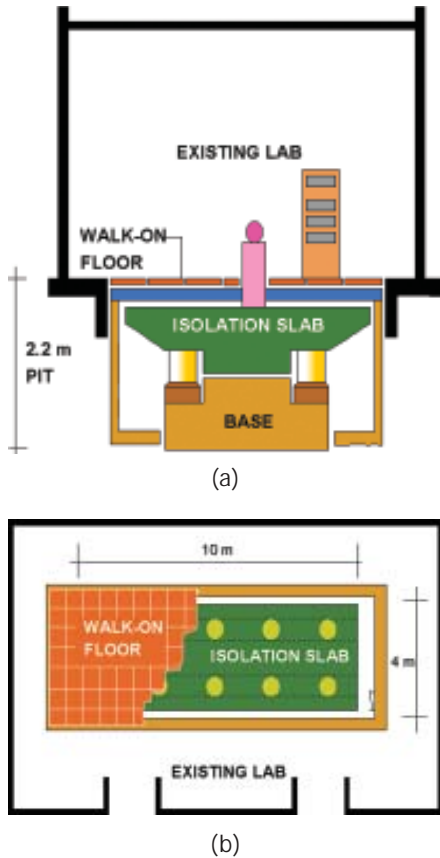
Conceptual section and plan views of NIST-A1 isolation system⁴
